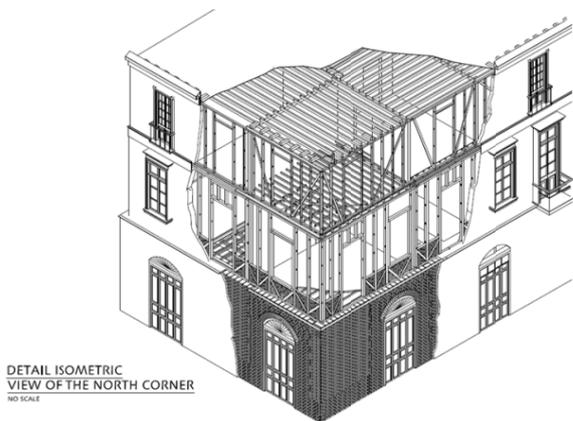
Isometric view of the structural configuration of Hotel Comercio. First floor has adobe walls [1].
